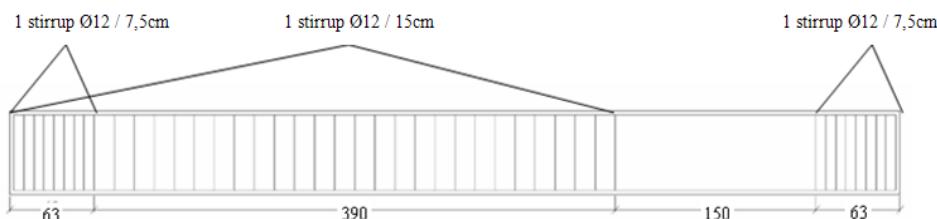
Distribution of transversal reinforcement of prestressed beams (cm).
